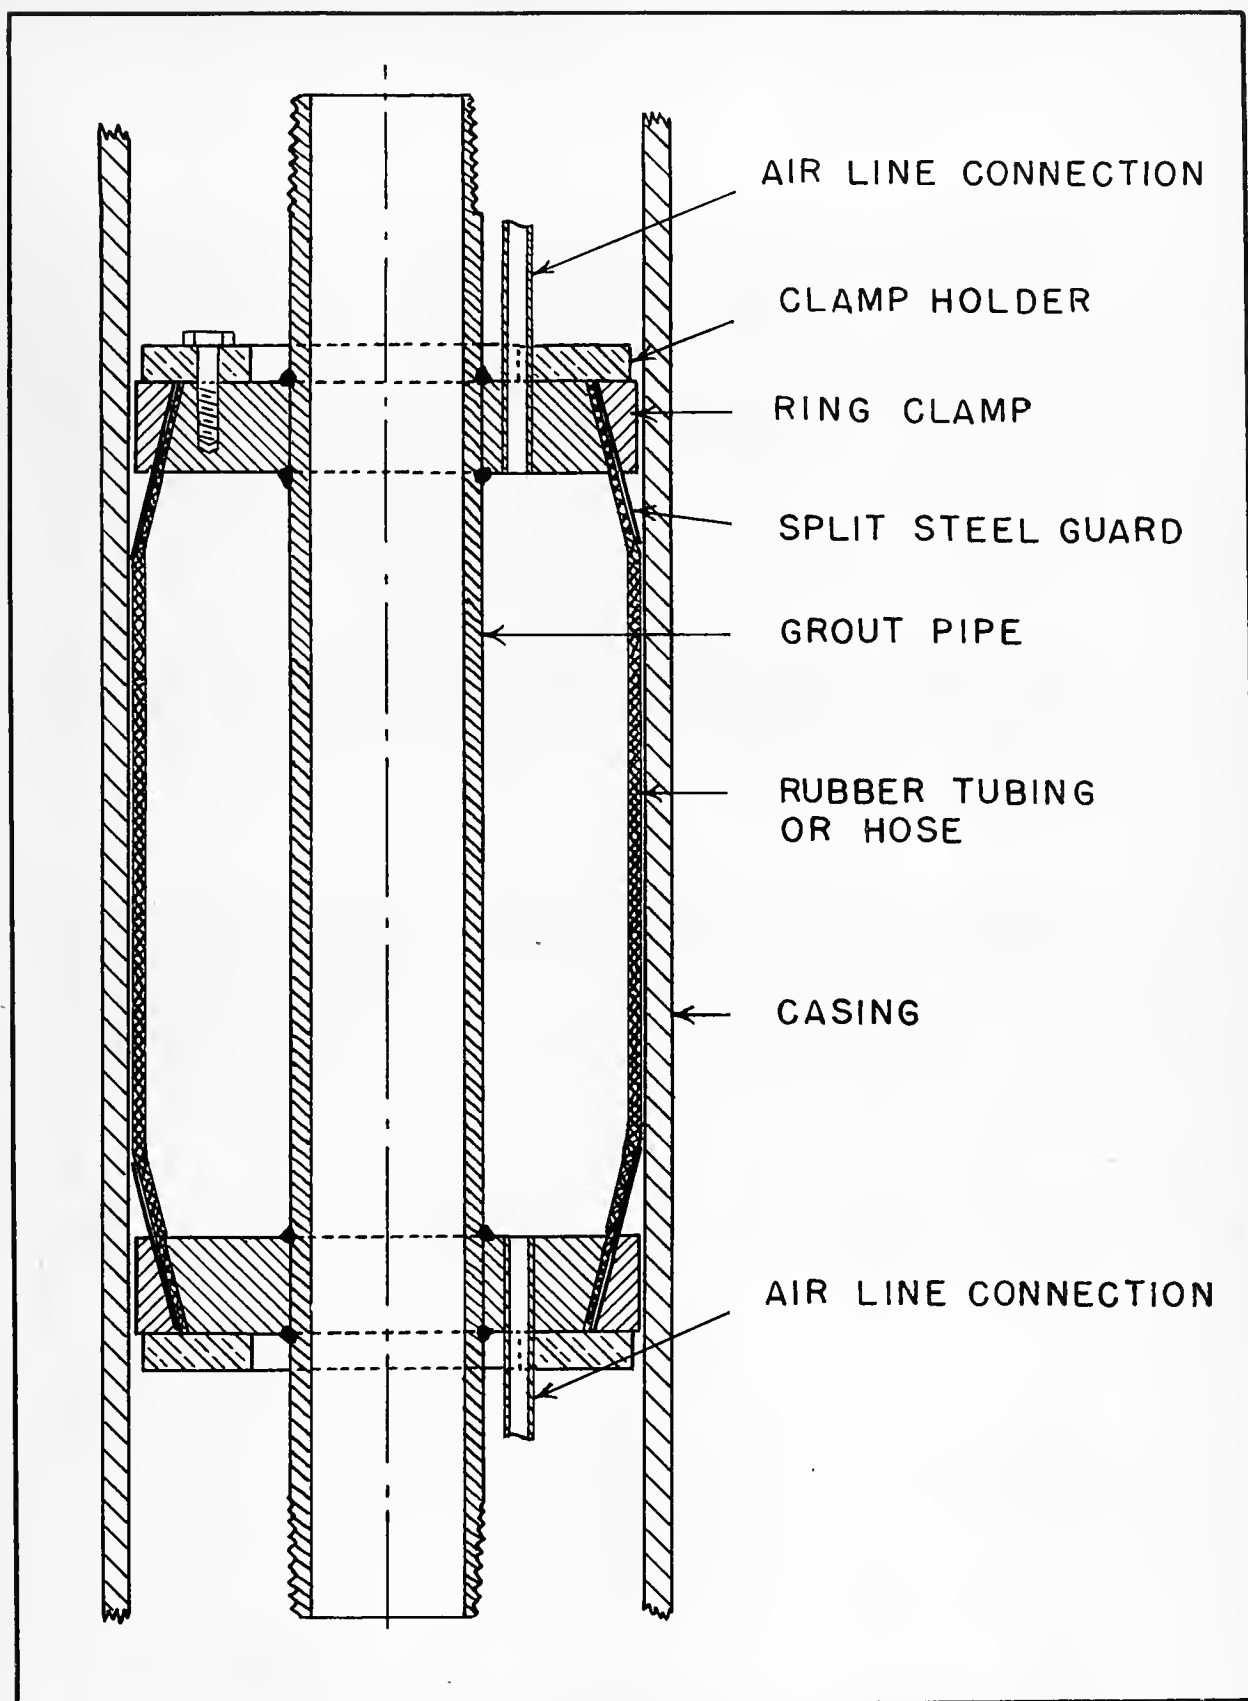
Sketch of Suggested Air Expanded Packer Plug.
